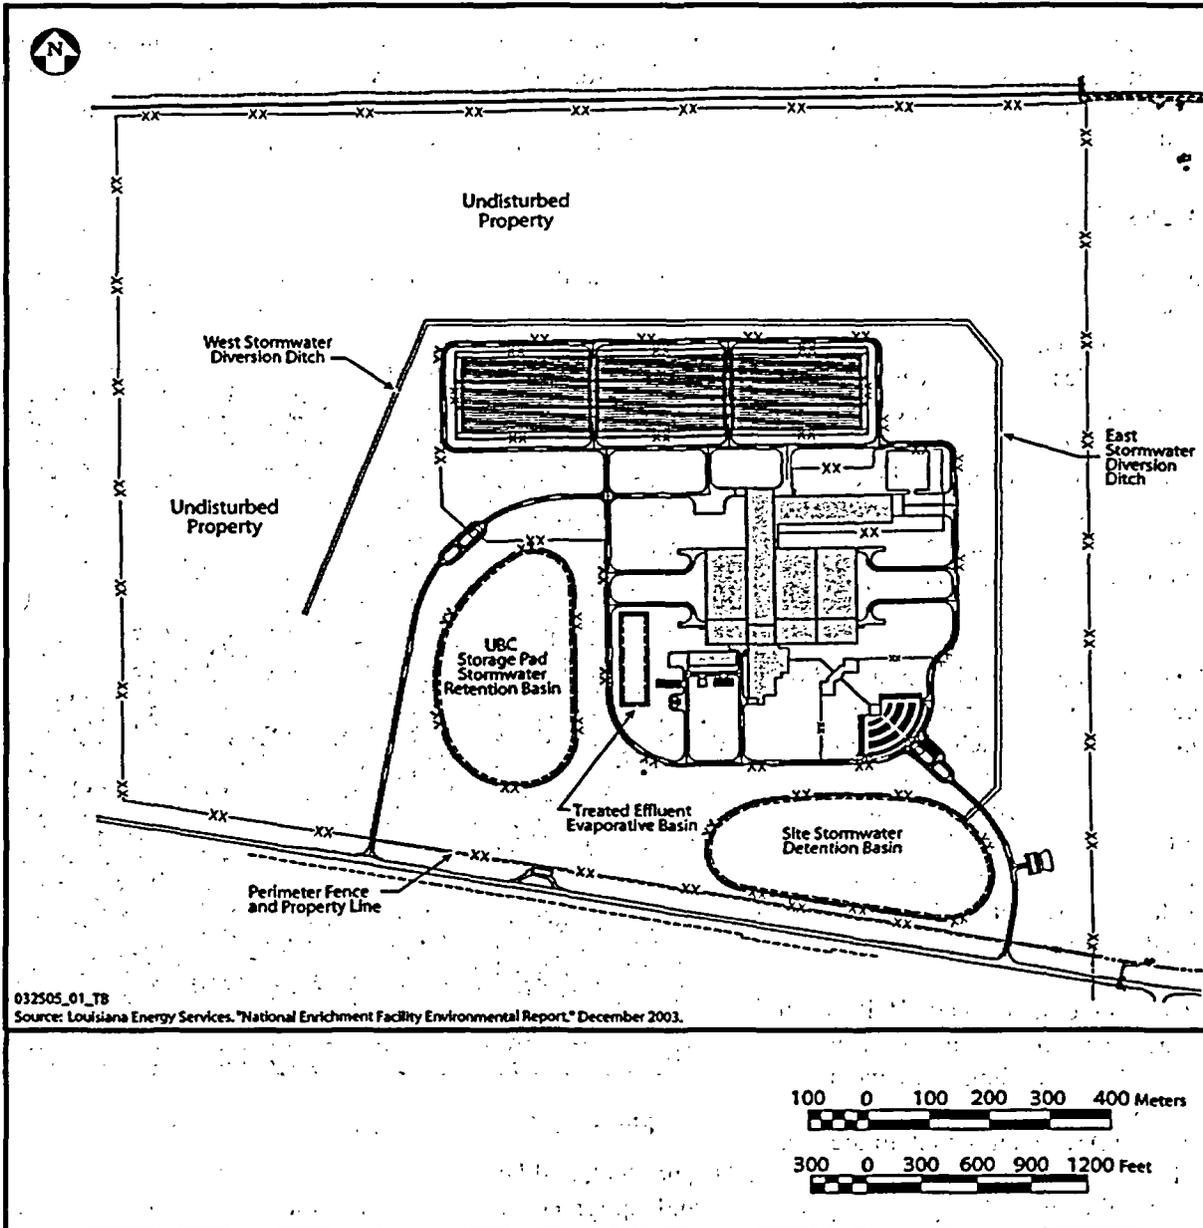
Proposed NEF Site Layout (LES, 2005a)
